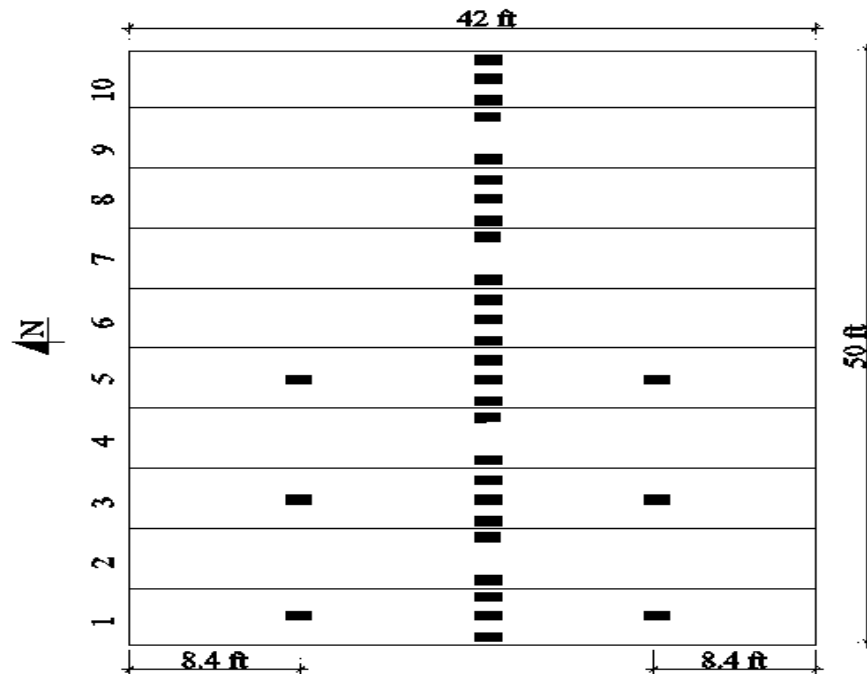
Plan view of instrumentation layout for proof load testing (Bridge 8825).
